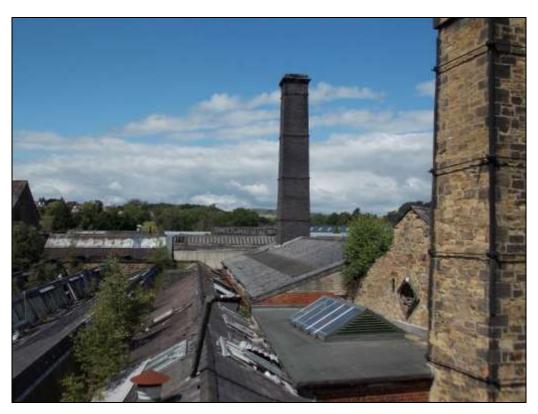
Unit 16d with engineering brick chimney stack, looking west.
